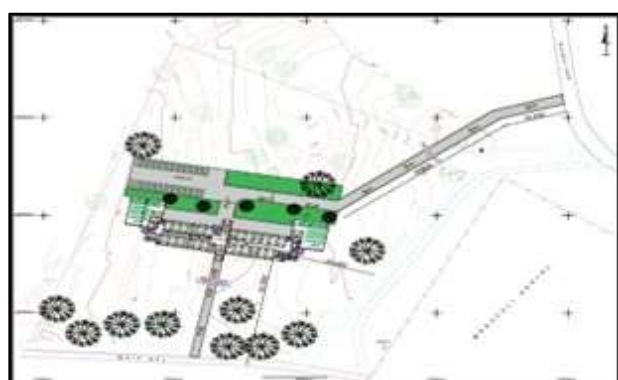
General Layout Plan of the Proposed Magufuli Female Hostel Building Site.
